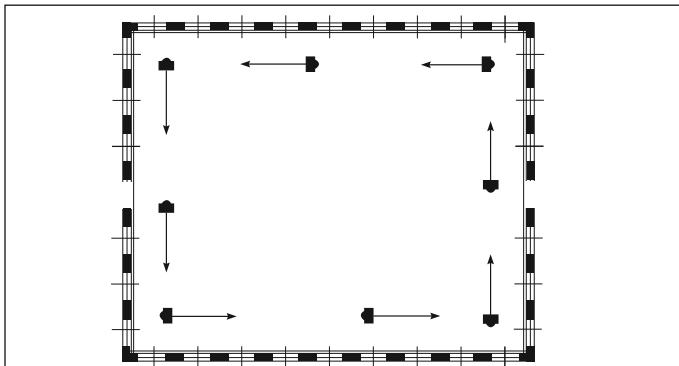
Unit Locations of Horizontal Units With 90° Hoods In Narrow Buildings
